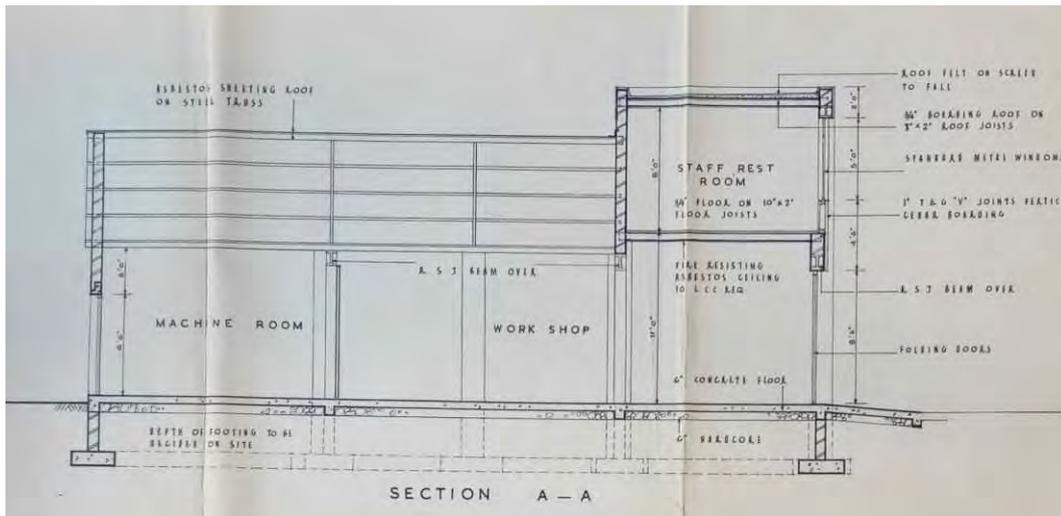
Architect's drawing showing a cross-section of the building at 21-25 Willow Way (LMA ref. GLC/AR/BR/34/003889)
